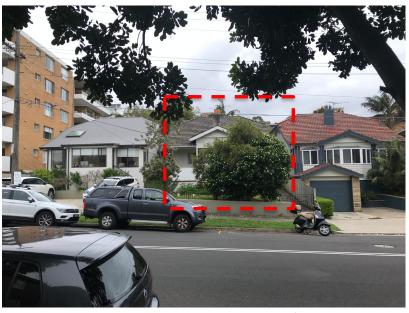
Existing dwelling from Lauderdale Ave (Noble Architecture)
